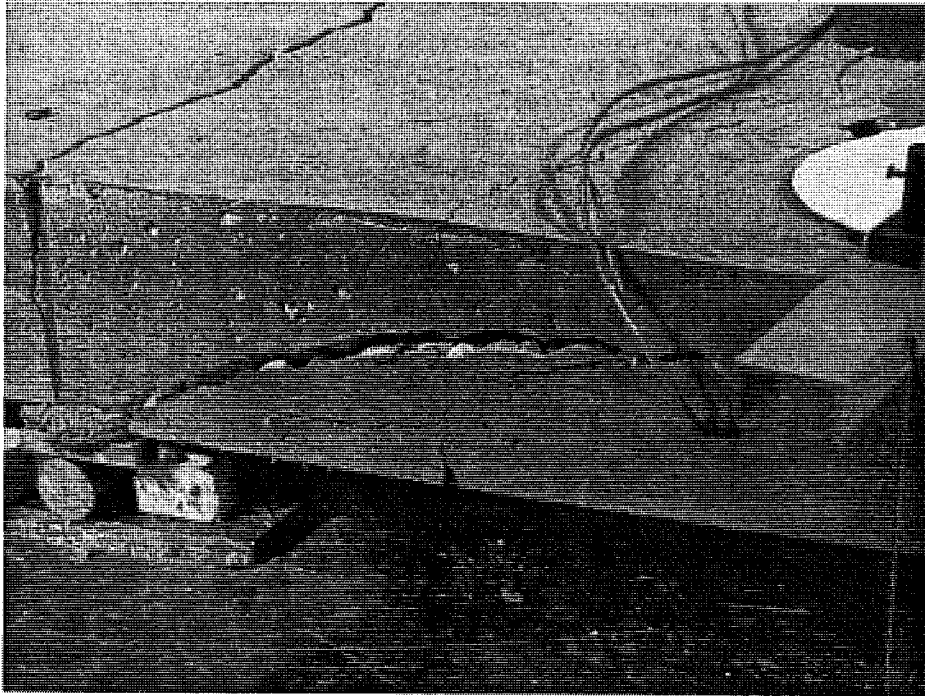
Inclined Cracks on the Slab Sides.
